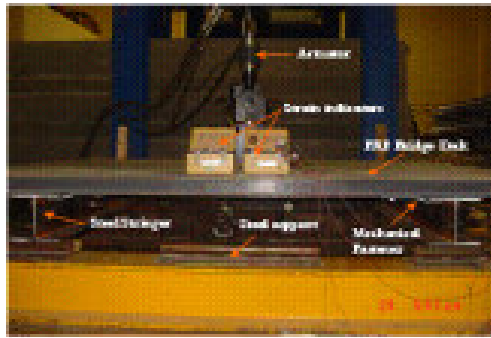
Test Set-up of FRP Bridge Deck System with Two Steel Stringers
